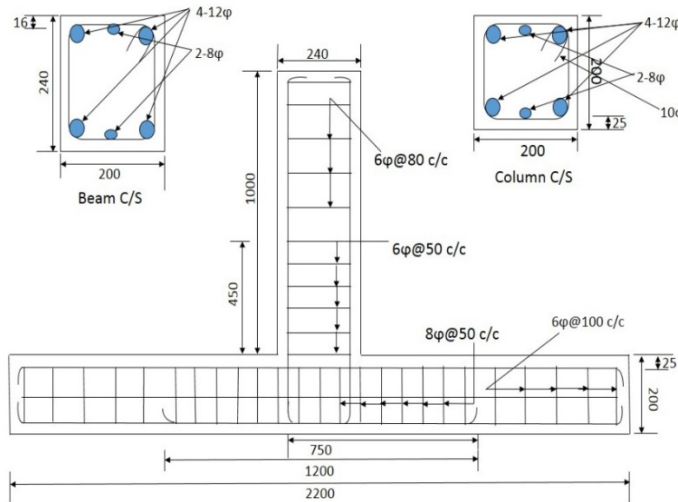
Reinforcement details for Beam-Column specimens (2/3 scale).
